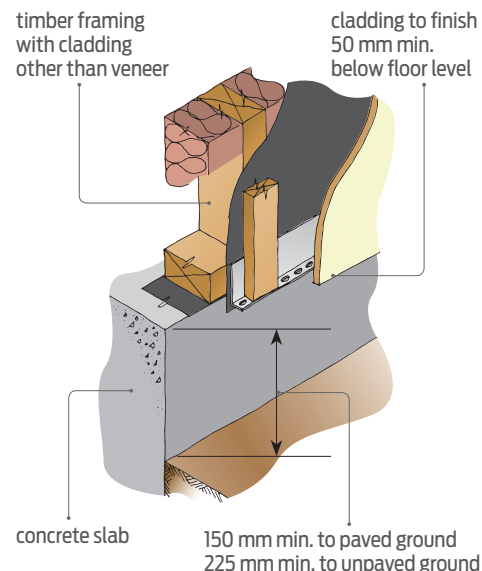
Minimum slab-to-ground clearances for other types of wall cladding.
